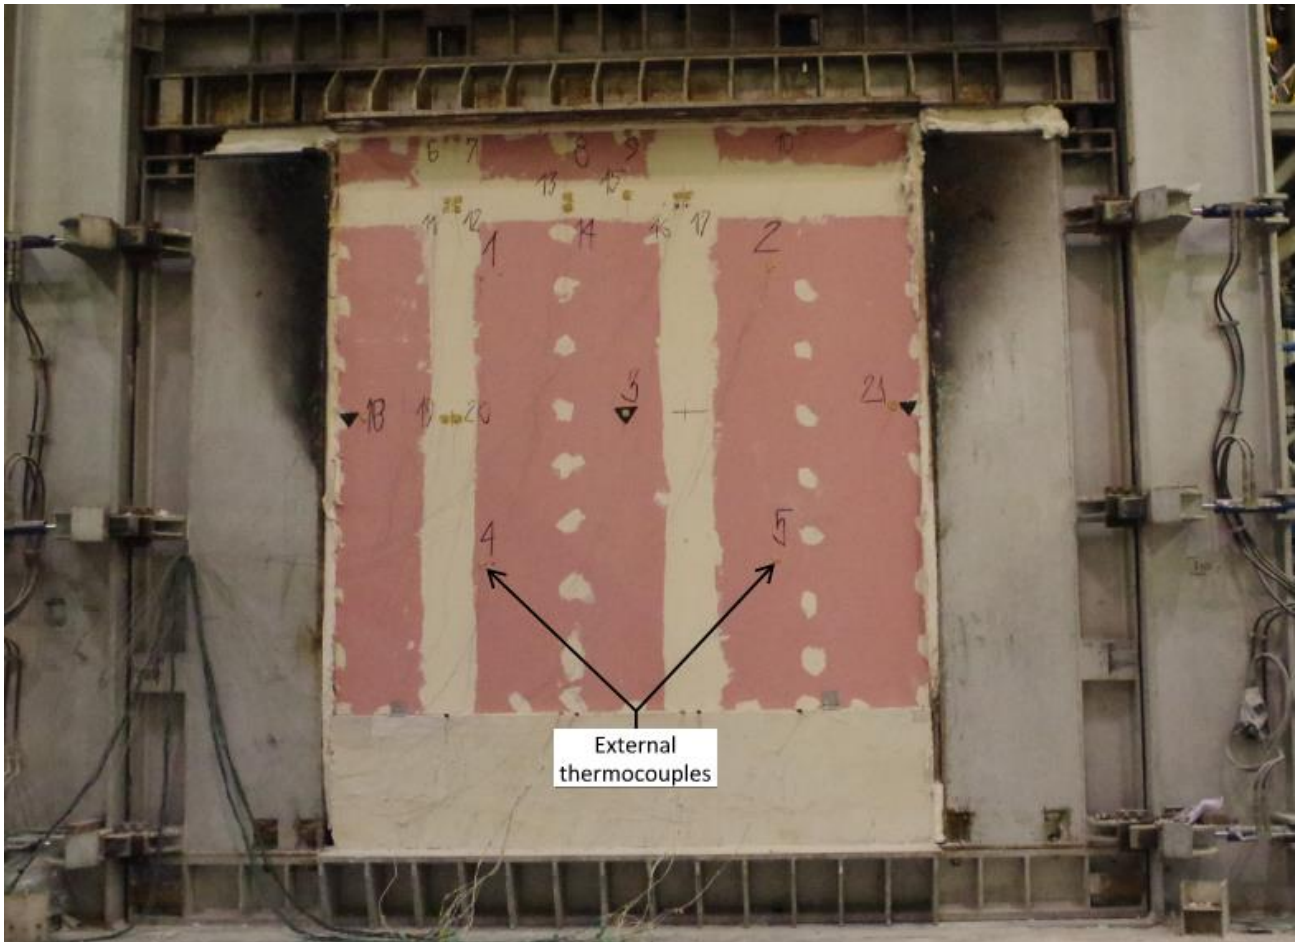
Picture of mounted wall specimen showing location of external thermocouples
